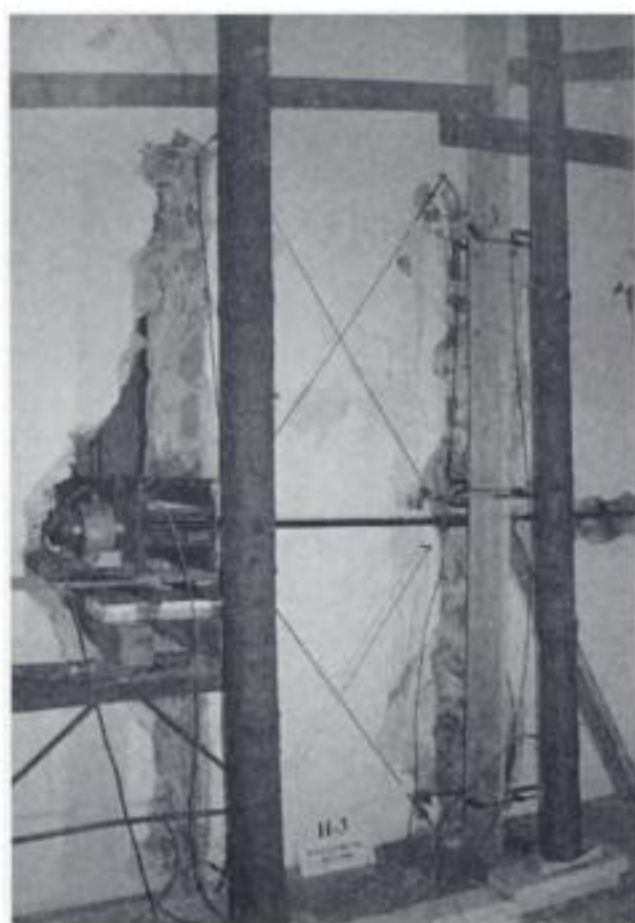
In-situ lateral resistance test of a stone-masonry wall.
